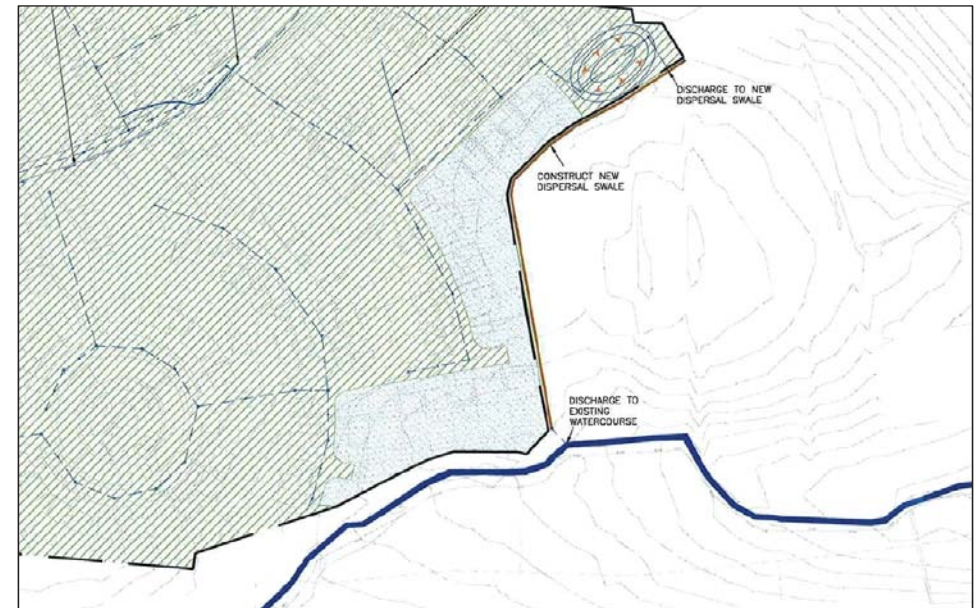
Typical surface water drainage proposal adjacent to the Local Nature Conservation Site.
